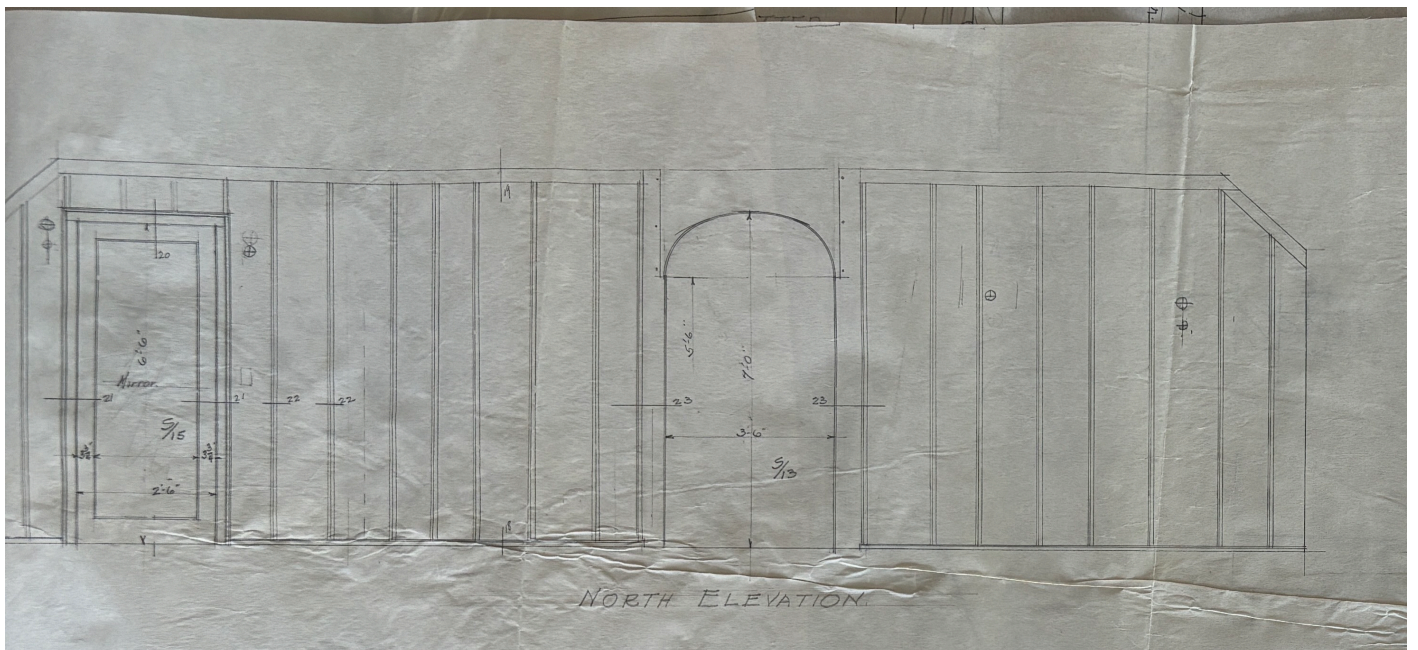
Plans for the arched passageway upstairs in the 1932 addition. From the R. Brognard Okie Architectural Papers. Photographed at the Pennsylvania State Archives in Harrisburg.
